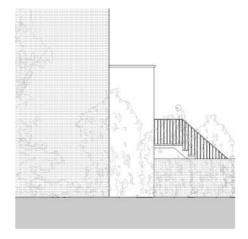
Side elevation showing existing and proposed. Currently a balcony and dwelling spot. Proposed is an access staircase which is no worse from an amenity point of view.
